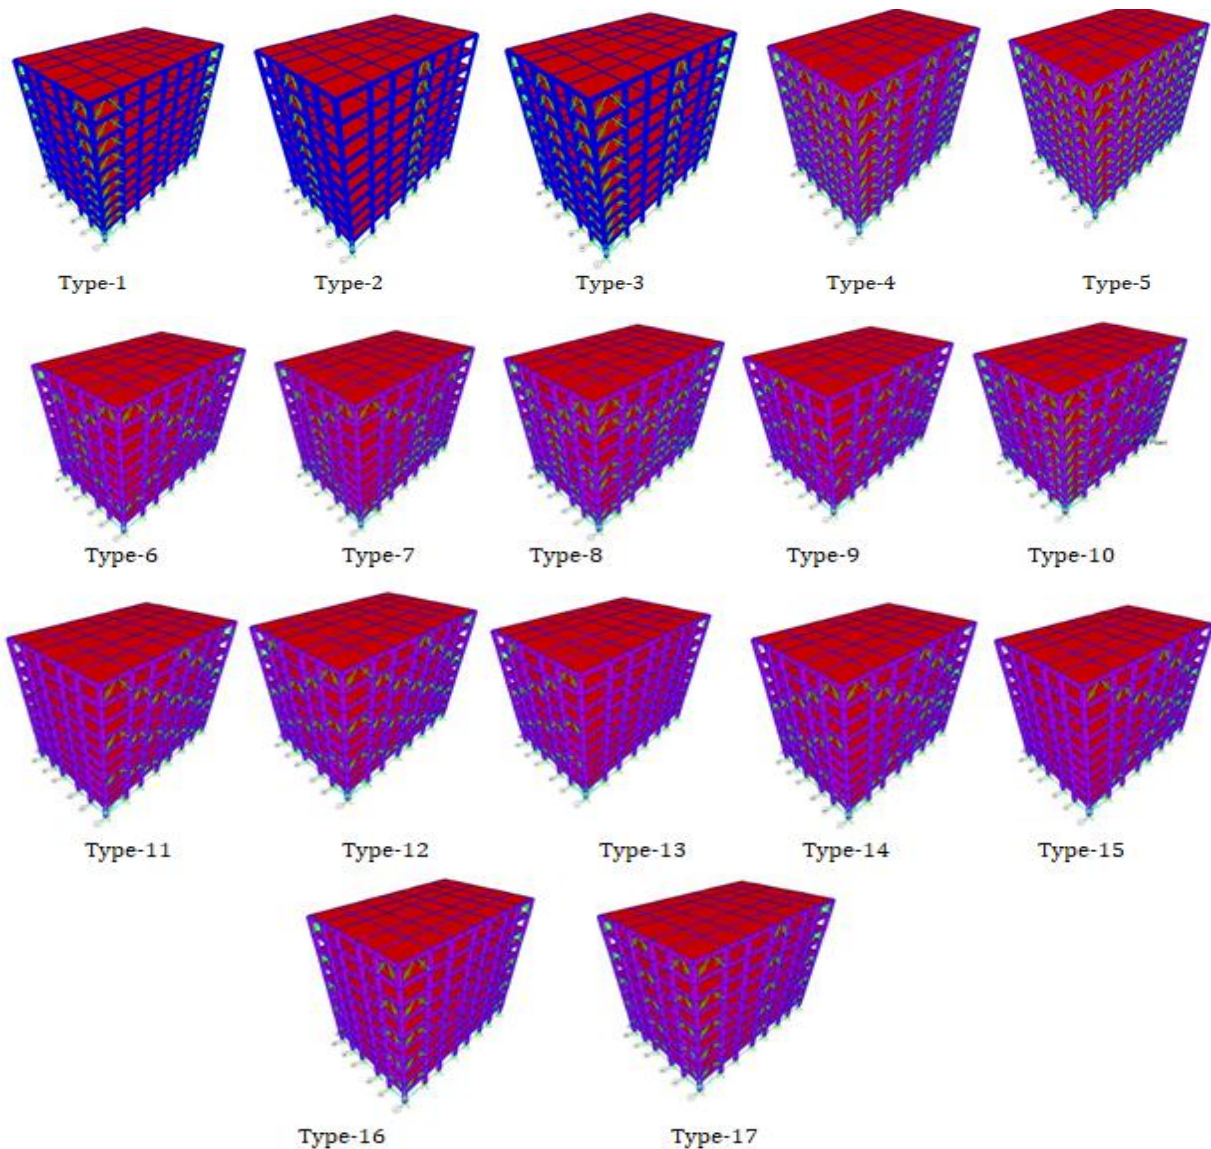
3D View of building with different types of arrangement of bracing (FVD)
